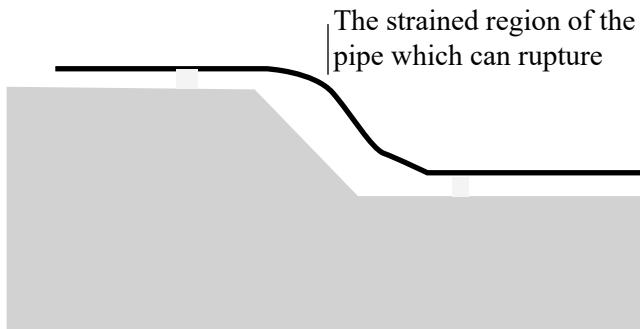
Failure of a pipe line crossing a fault line with firm clamps on the two sides of the fault
